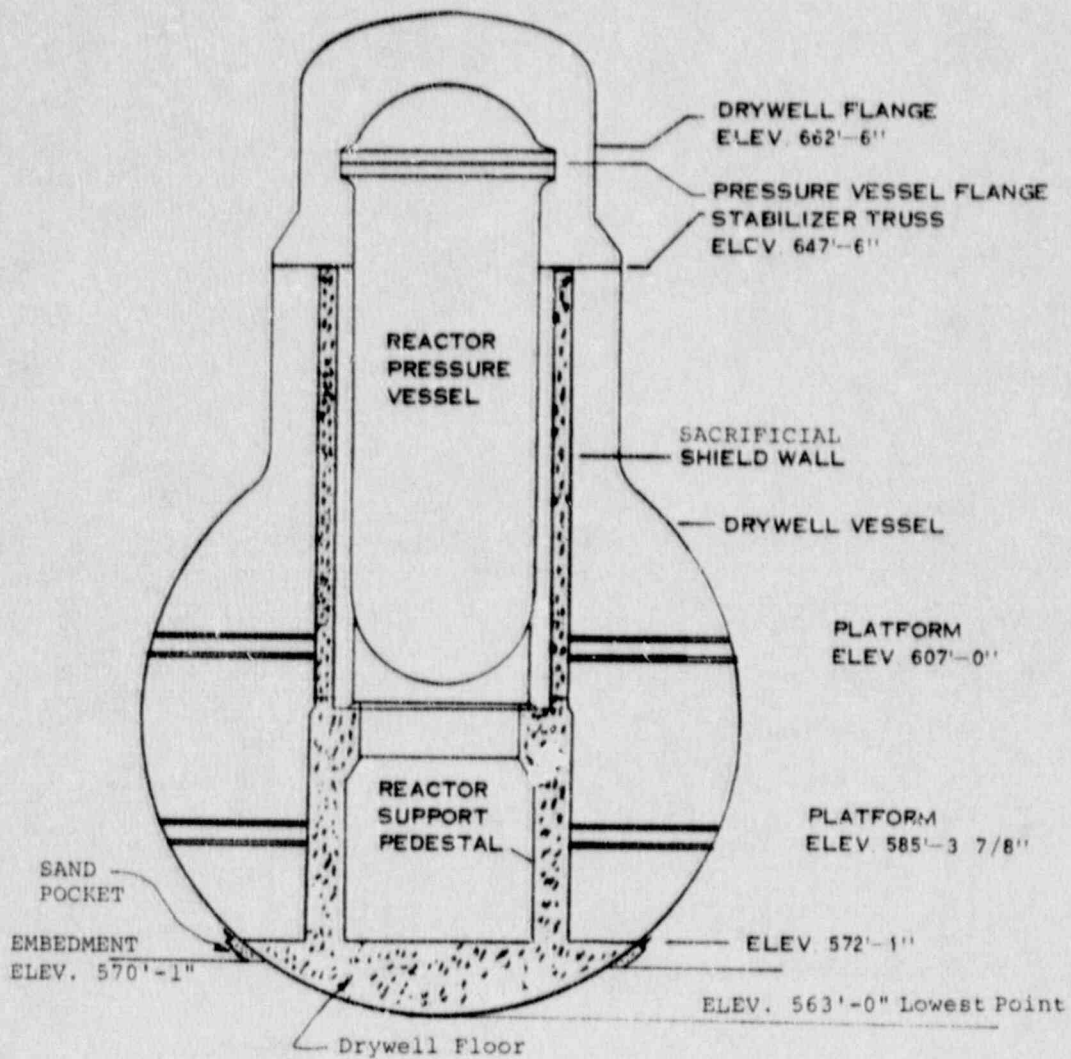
SECTION THROUGH CENTER LINE OF DRYWELL
